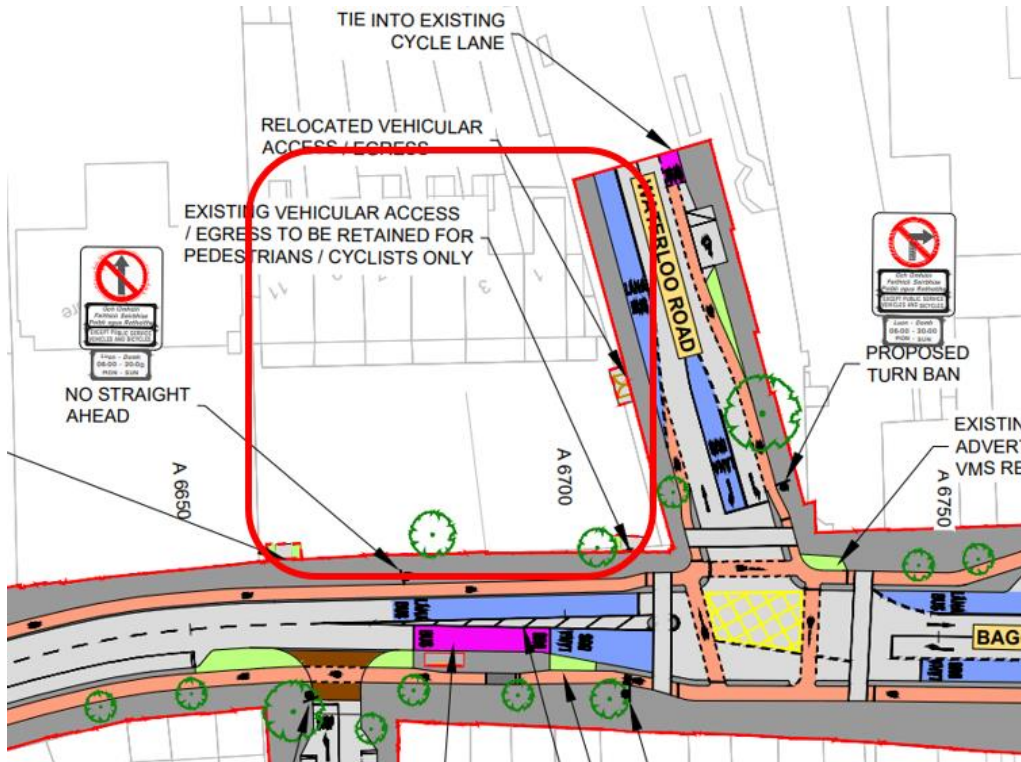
Proposed new Layout at 1-11 Pembroke Road
